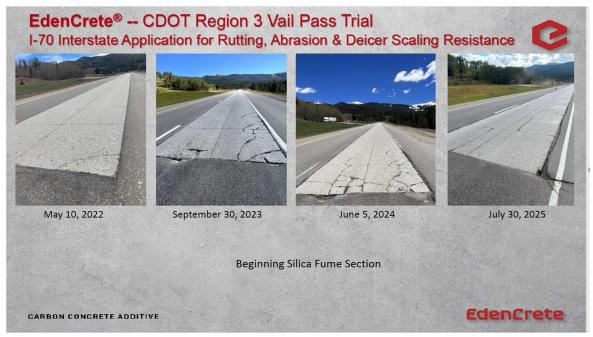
Silica Fume concrete – Beginning Section (2 panels at the start replaced with bitumen to remove safety hazard).
